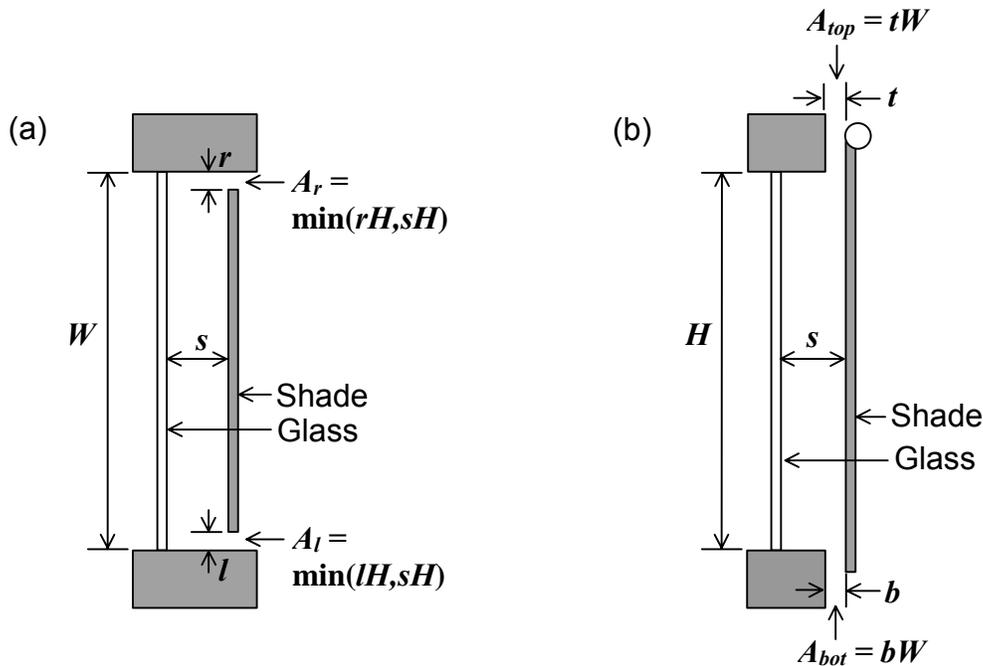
Examples of openings for an interior shading layer covering glass of height H and width W . Not to scale. (a) Horizontal section through shading layer with openings on the left and right sides (top view). (b) Vertical section through shading layer with openings at the top and bottom (side view).
